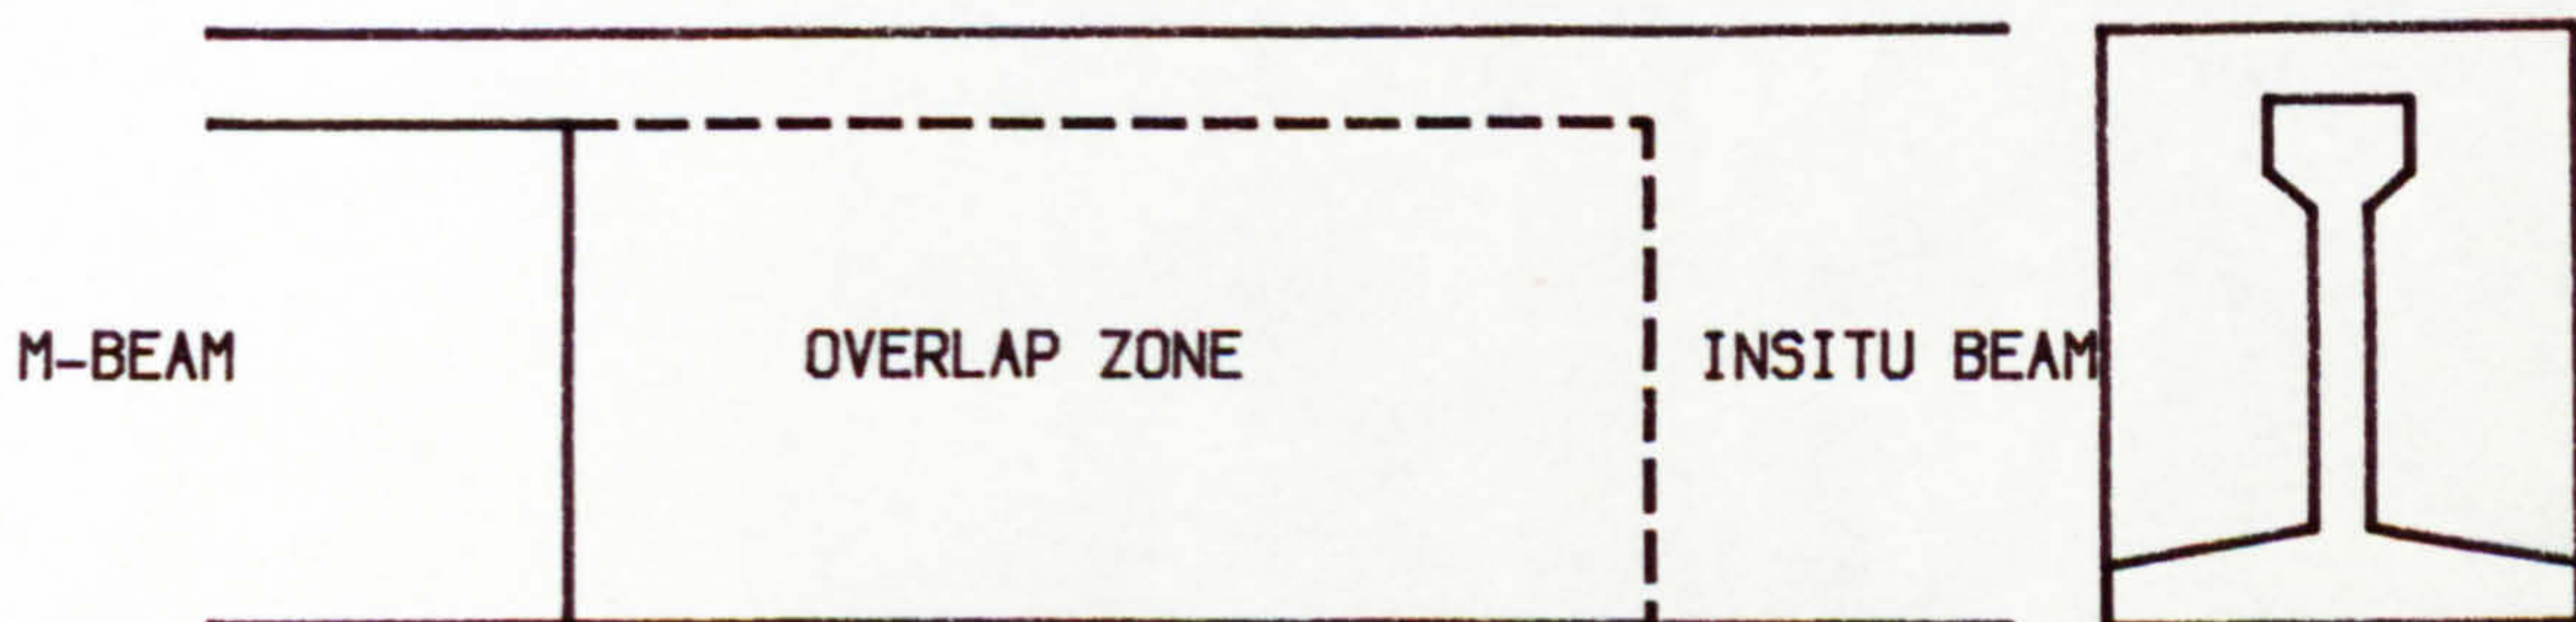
19 VERTICAL SEPARATION BETWEEN PRECAST BEAM AND IN-SITU NIB
